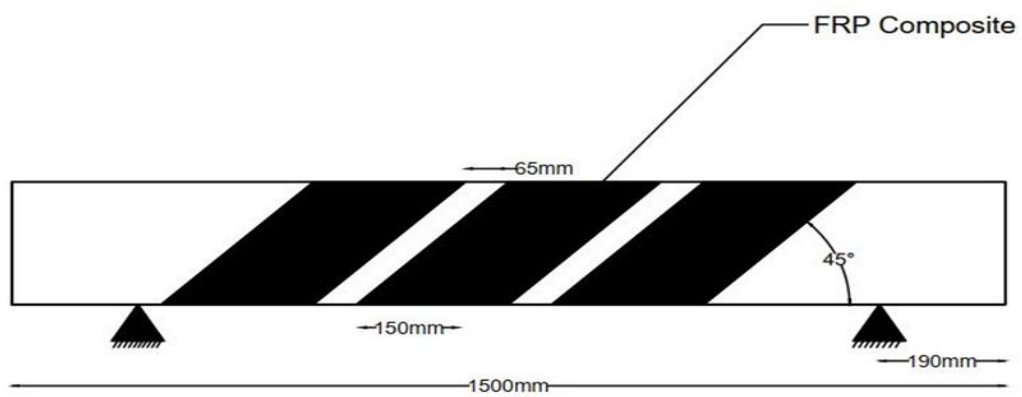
Designed RC beam with 45° inclined FRP wrapped strip
